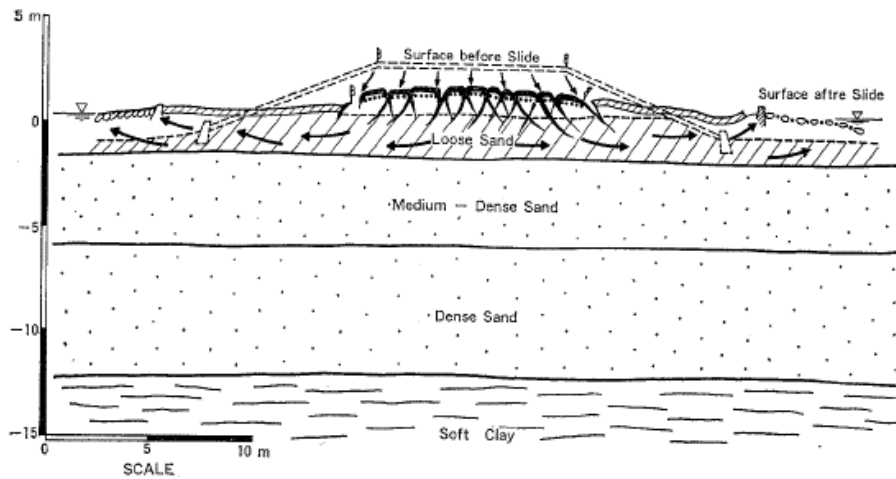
Soil stratigraphy and pre-failure and post-failure cross-sections of the Hachiro-Gata Road Embankment (Ohya et al., 1985)
